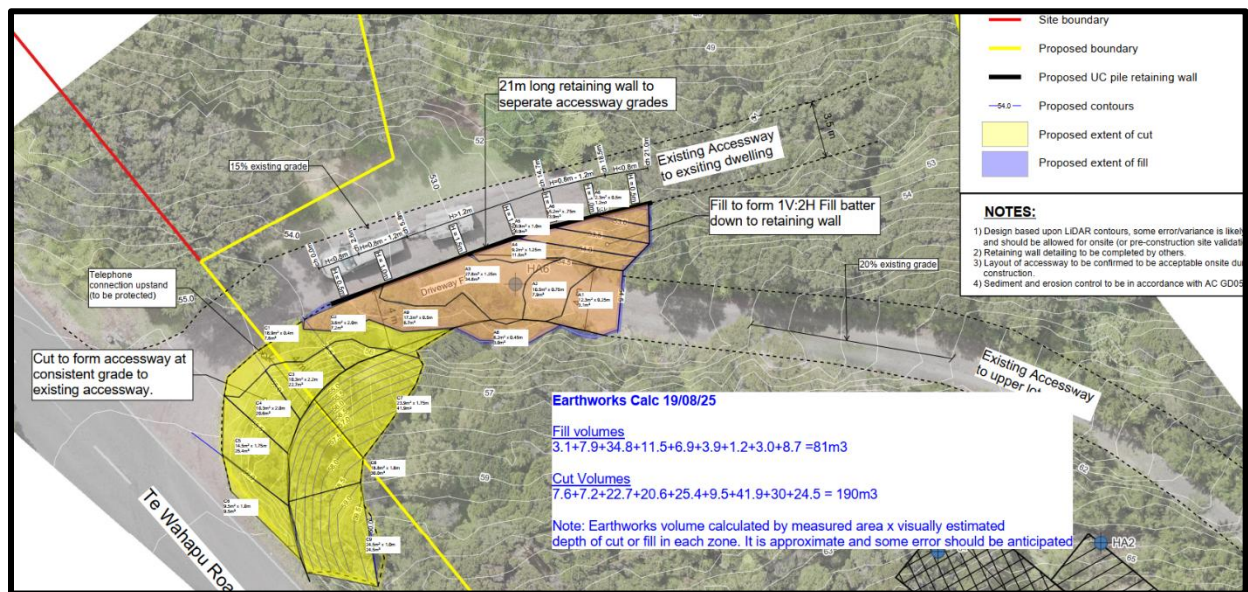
Image showing proposed excavations and retaining wall as well as proposed access to Lot 3.
